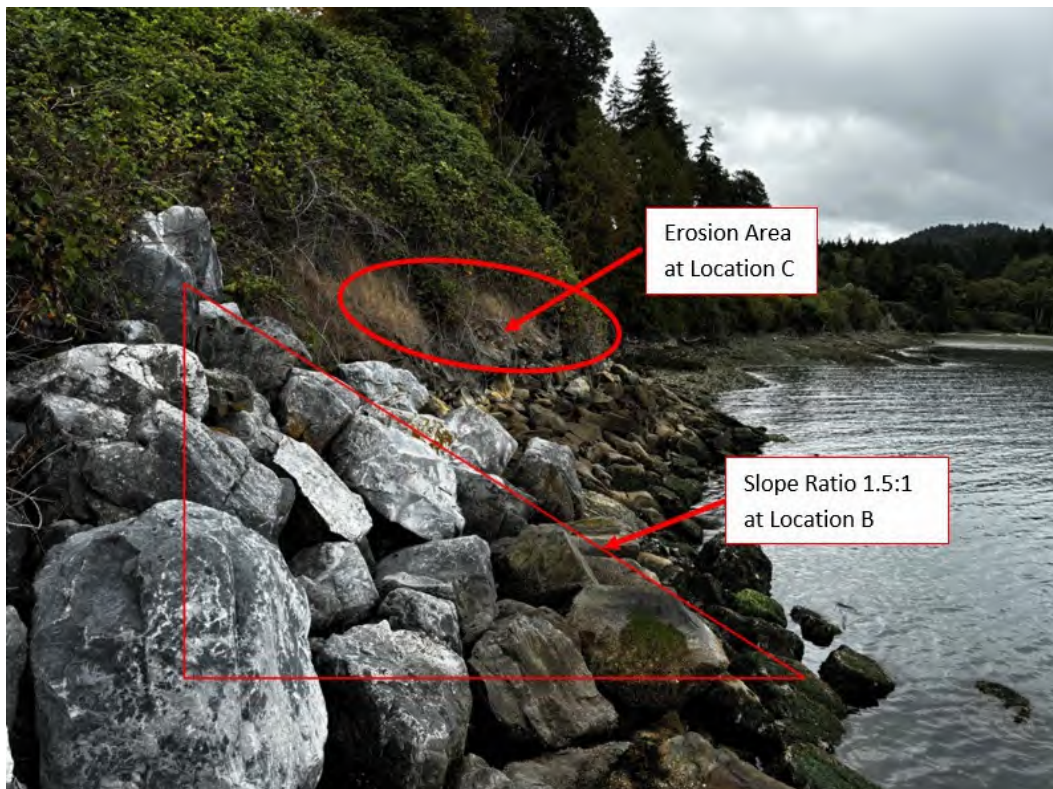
Zone 1 – Location B and Zone 2 - Location C
